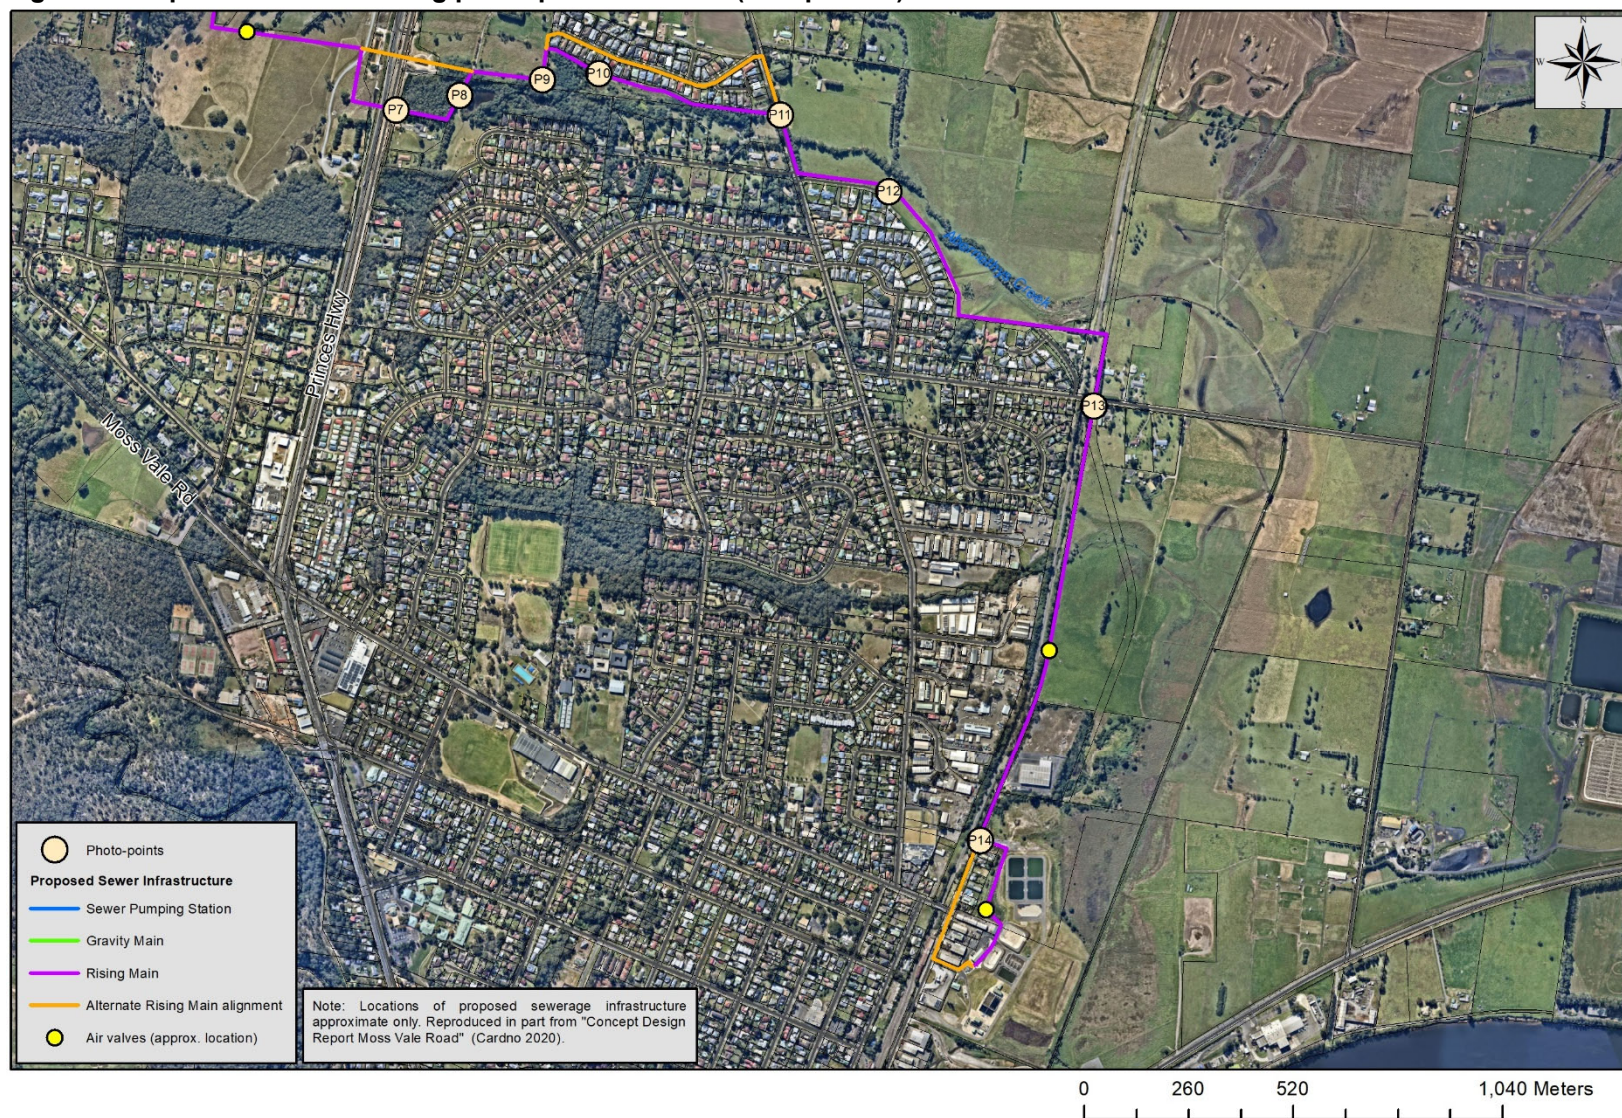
Proposed works showing photo-point locations (south-west portion – SPS21)
